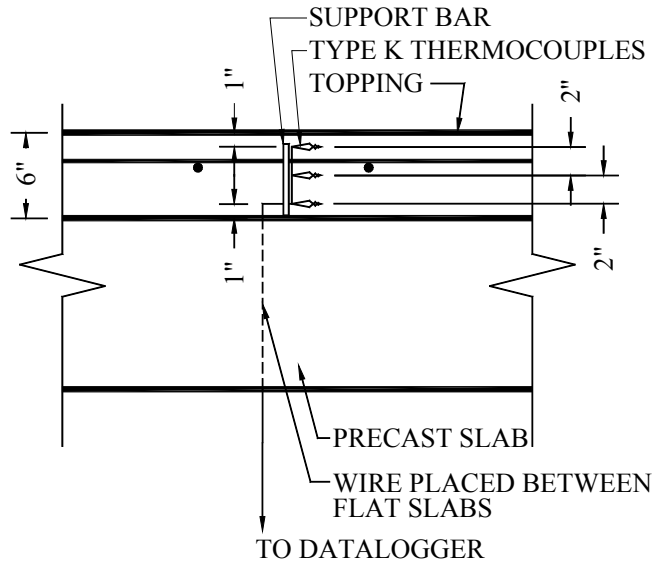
Partial section view of specimen with typical thermocouple profile layout
